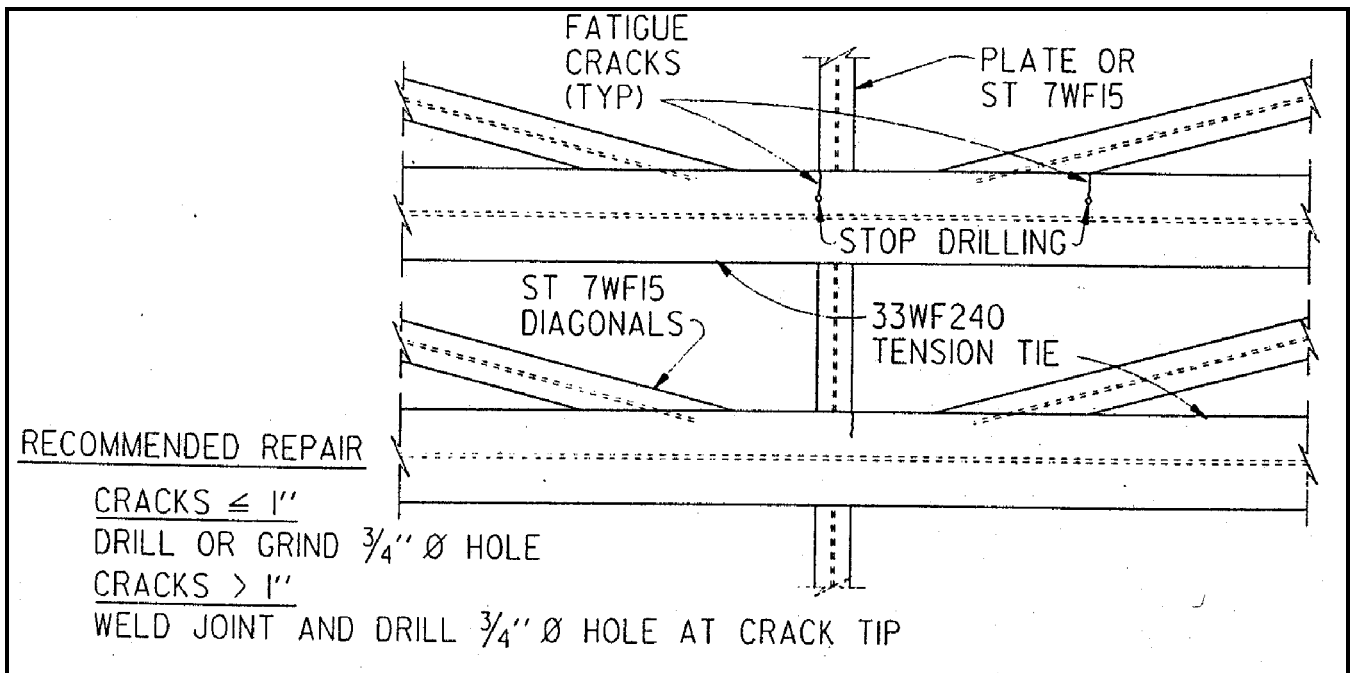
Typical cracking located at downstream bracing to tension tie flange
